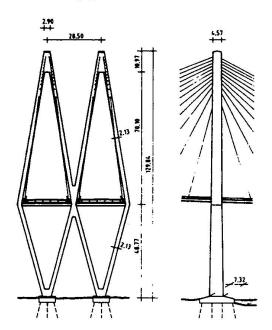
BAYTOWN bridge in the USA - Tower layout
